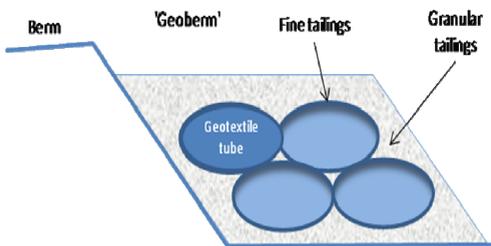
Geotextiles tubes as structural elements in 'goberms' (Gomes 2007).
